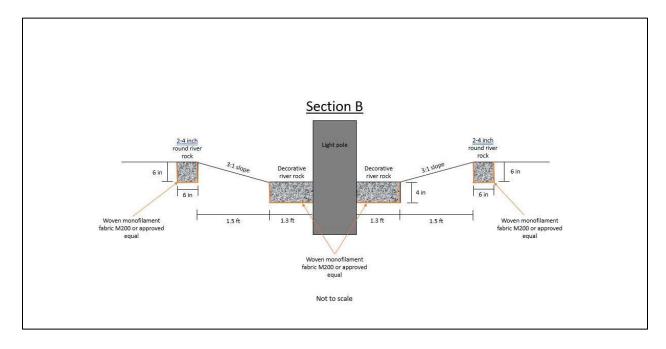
Cross-section design for Section B of the Townwood Park GSI project.
